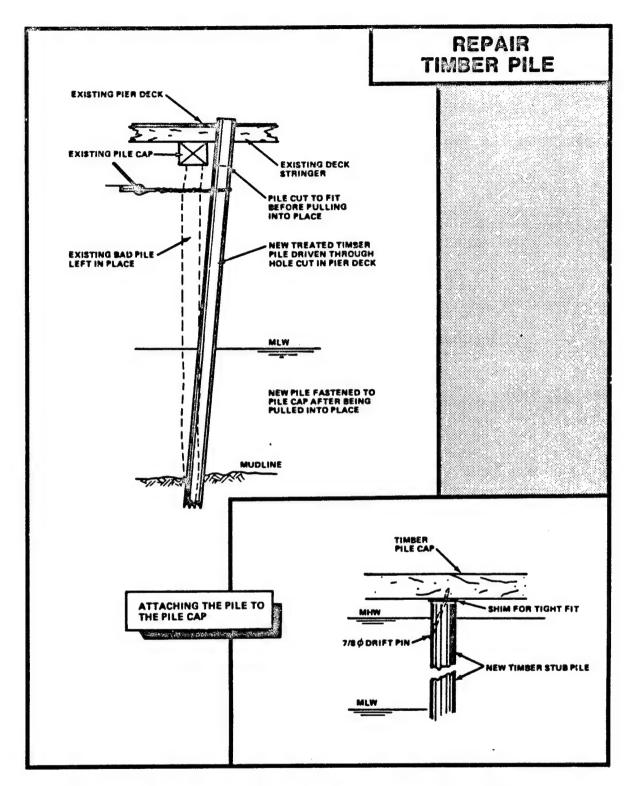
Replacing a Damaged Pile with a New Timber Pile.
